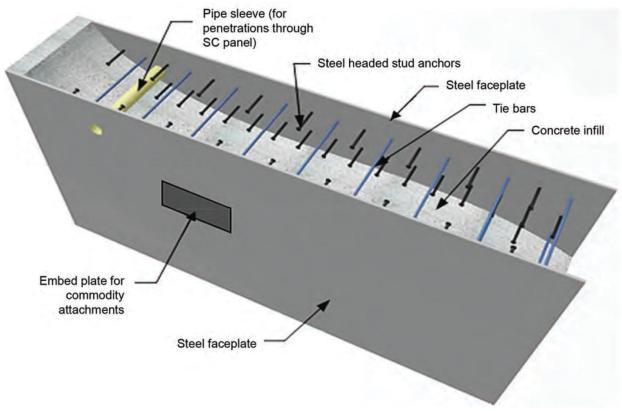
Typical Steel-Plate Composite Structure [4]
